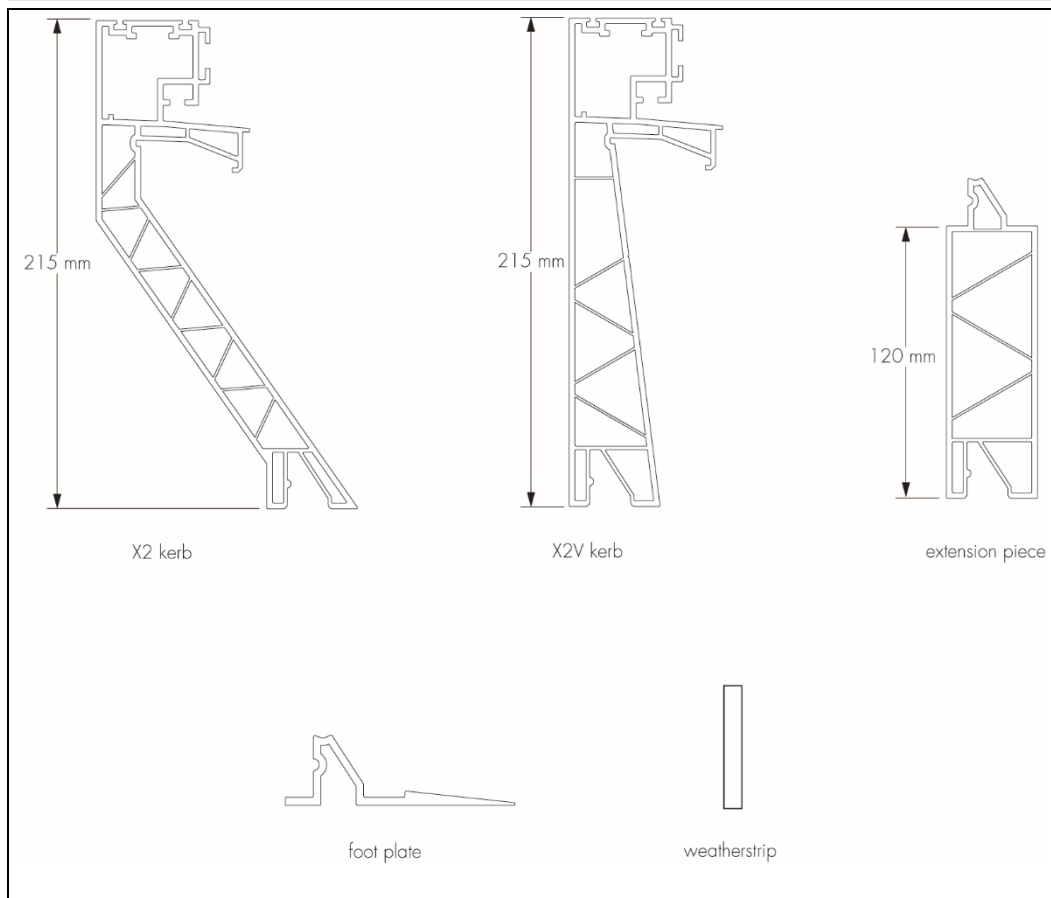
Cross sections of Bauder Continuous Barrel Vault Rooflights and Kerbs
